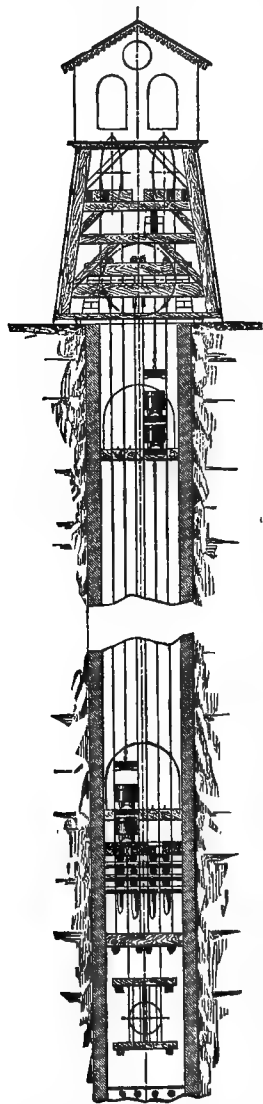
Arrangement for lowering filling at Lyons shaft.
